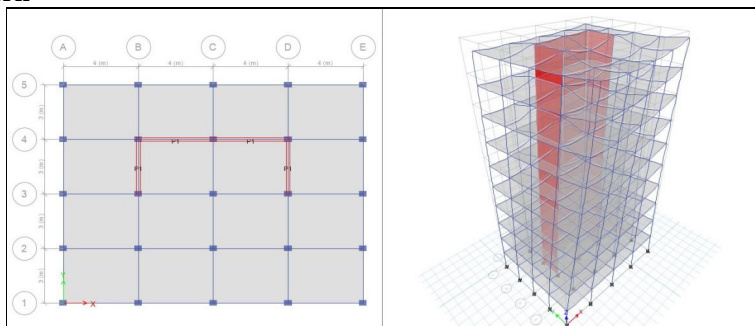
C pattern frame with shear wall and flat slab
